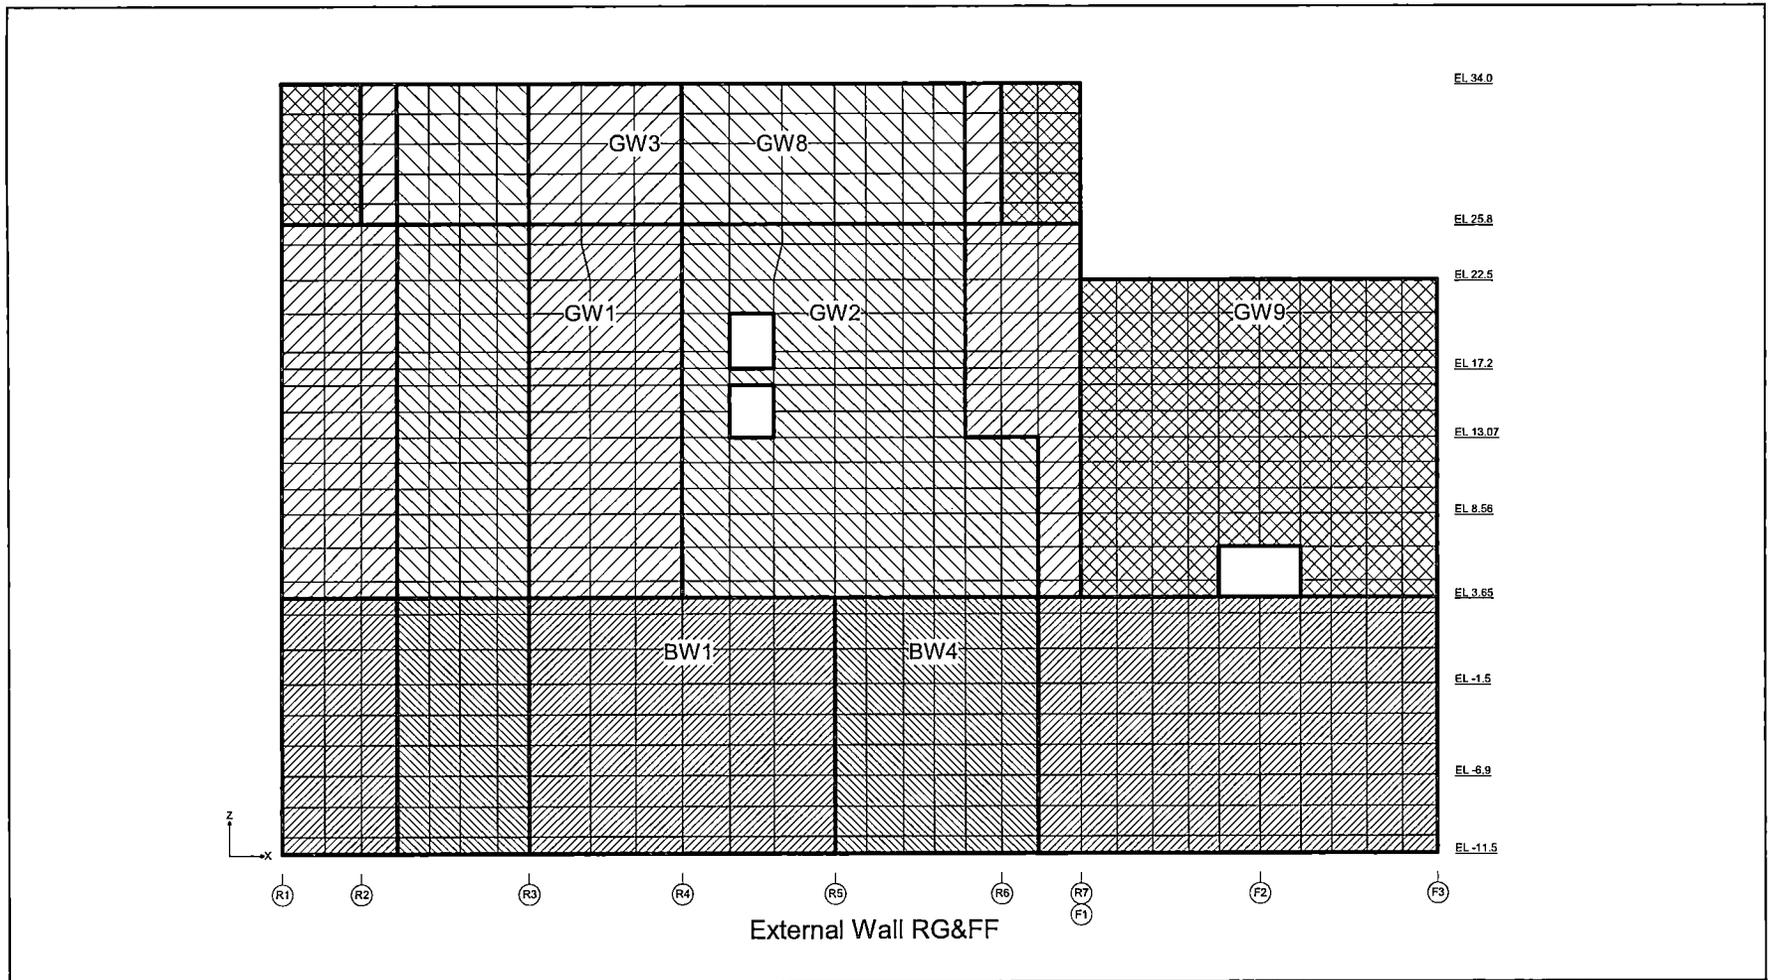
Application of Thermal Load on the External Wall (RG FF)
